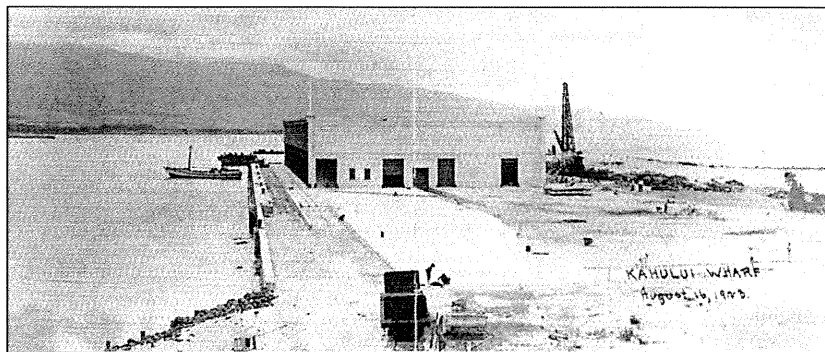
Construction of Pier One at Maui Wharf, 1923 (Source: Bartholomew 1994).
